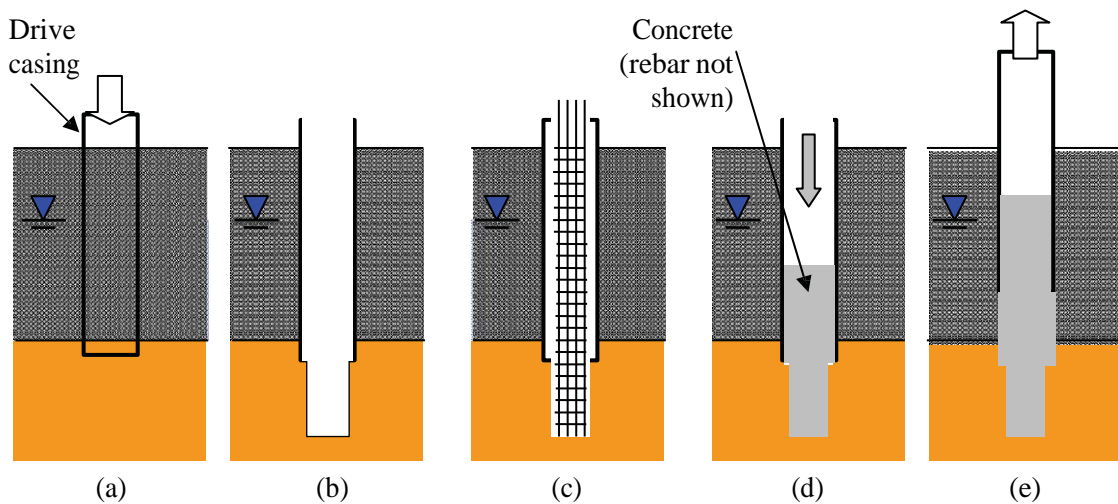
Construction using casing advanced ahead of excavation: (a) drive casing into bearing stratum; (b) drill through casing; (c) complete and clean hole, set reinforcing; (d) place concrete to head greater than external water pressure; (e) pull casing while maintaining sufficient concrete head.
